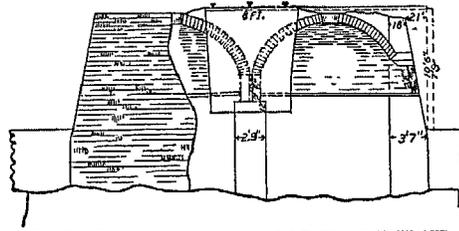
PART TRANSVERSE SECTION, PART END VIEW AND ELEVATION OF PIERS.
